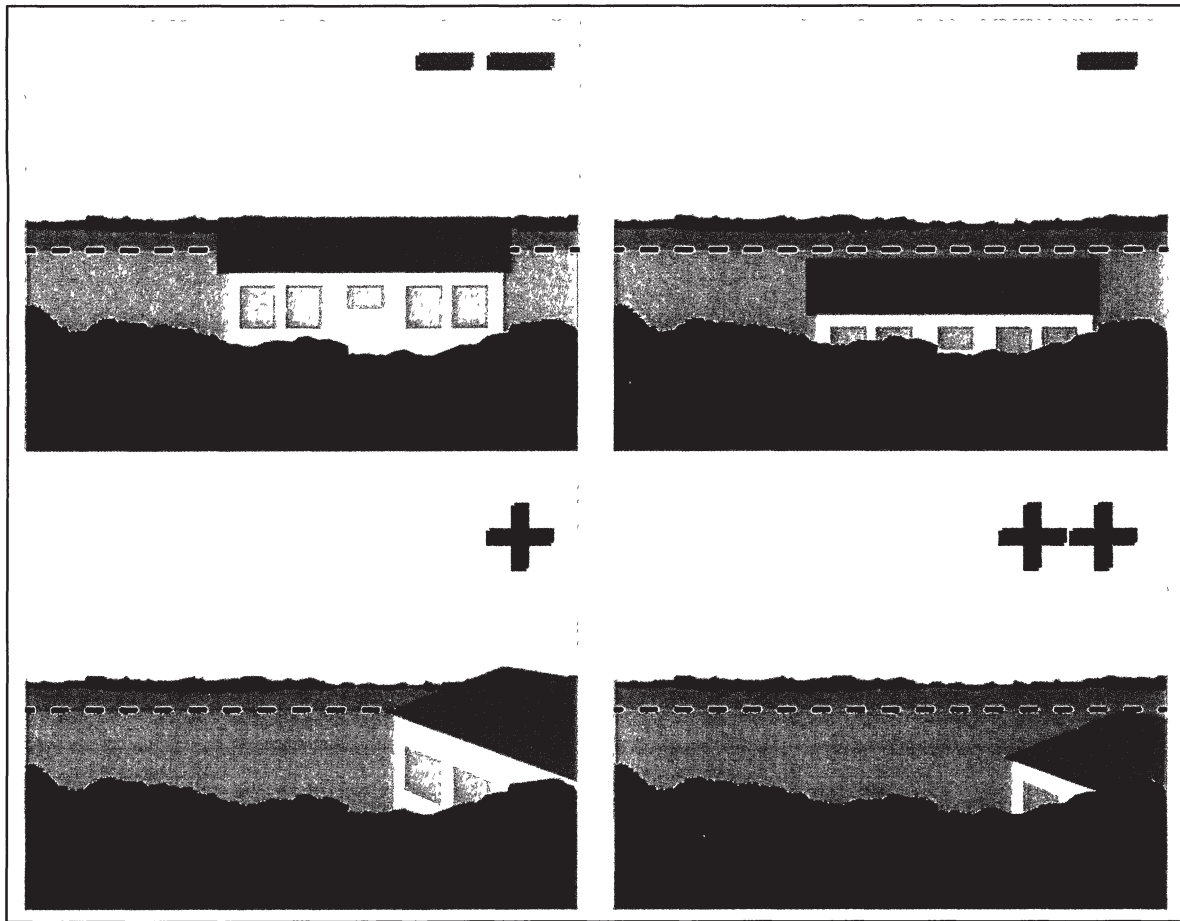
Example of Preferred Locations of a Structure to Preserve Views
